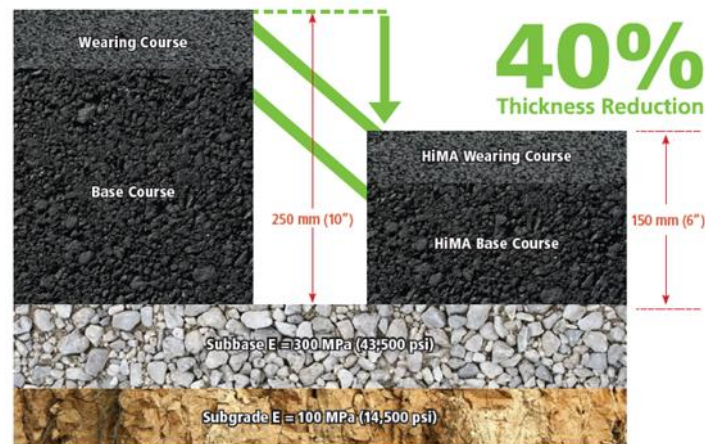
Example construction with layer thicknesses of the reference section and the section with highly modified asphalt.
